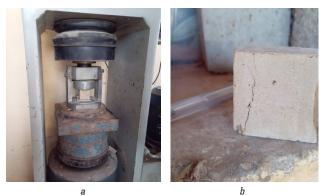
Crushing tests on the specimens: a - crushing press; b - specimens after crushing
